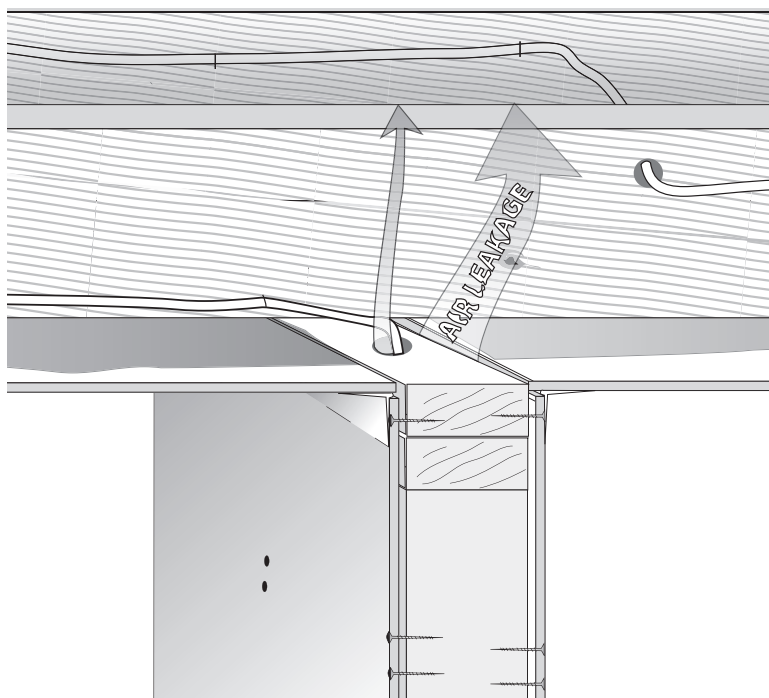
Air leakage at the junction between interior partition walls and the attic
